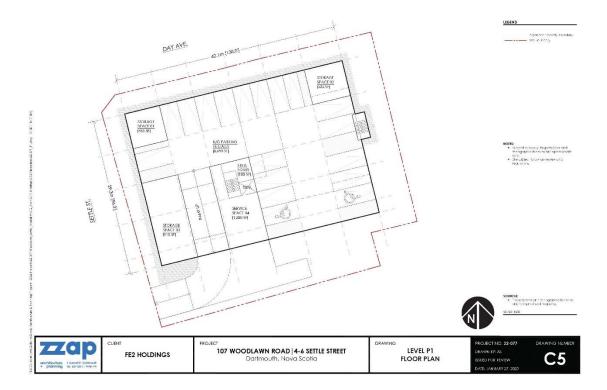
107 Woodlawn Road Level 1 Floor Plan
